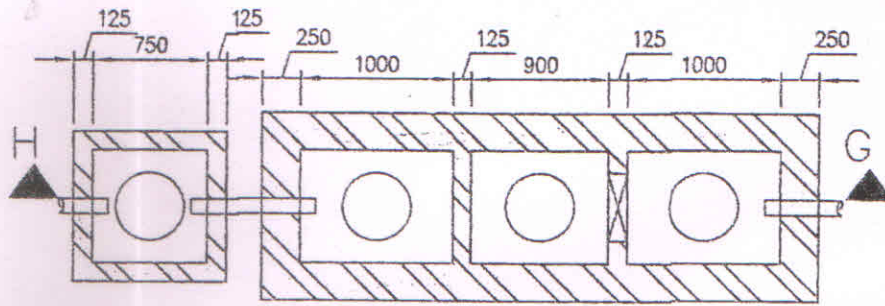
DETAILS OF SEPTIC TANK & CHLORINATION TANK
